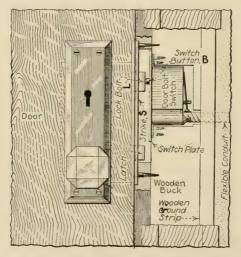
Showing a door-bolt switch installed in the door jamb with wood screws. They can also be mounted on the strike by using spacers and machine screws furnished with the switch or directly on the back of a box strike without the spacers. Two holes are tapped in the switch plate for the screws. The drilling of the strike is as shown. (Cutler-Hammer Mfg. Co., List No. 7242.)
